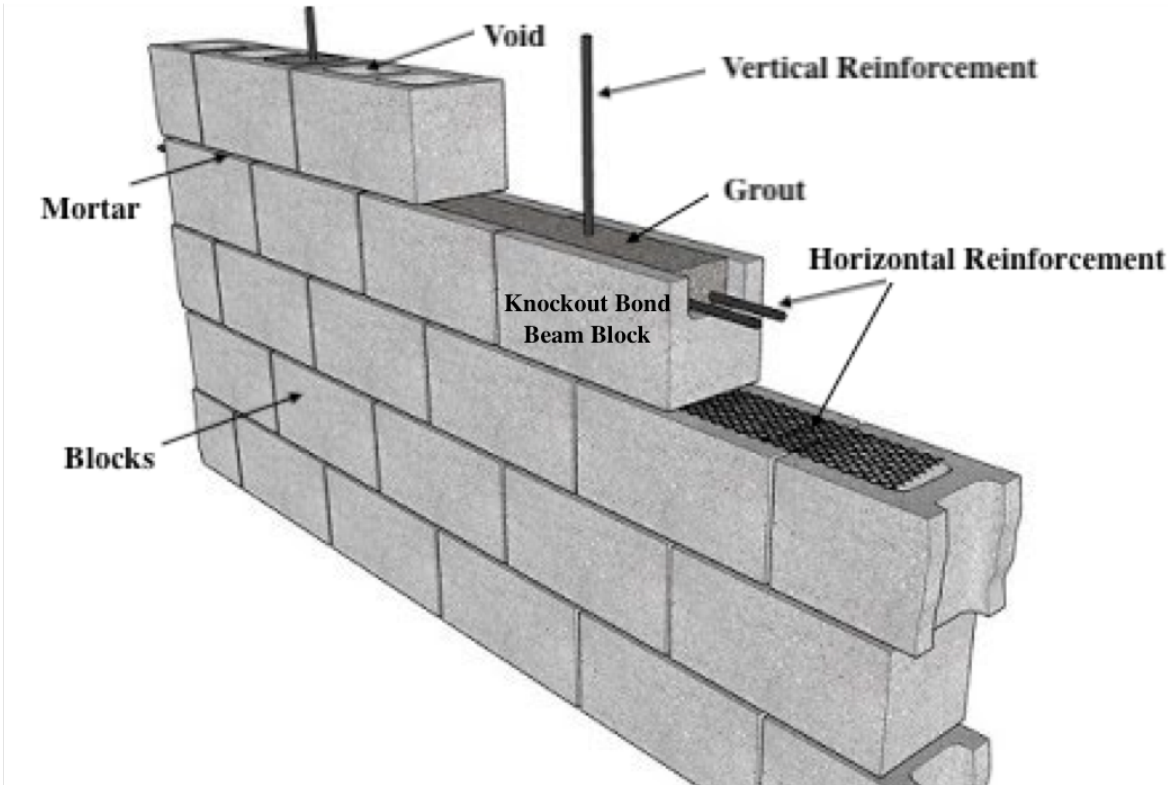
Schematic illustrating the arrangement of the vertical reinforcement placed inside the grouted cell voids of masonry blocks and the horizontal reinforcement placed in the grouted courses built with bond beams/knockout units
